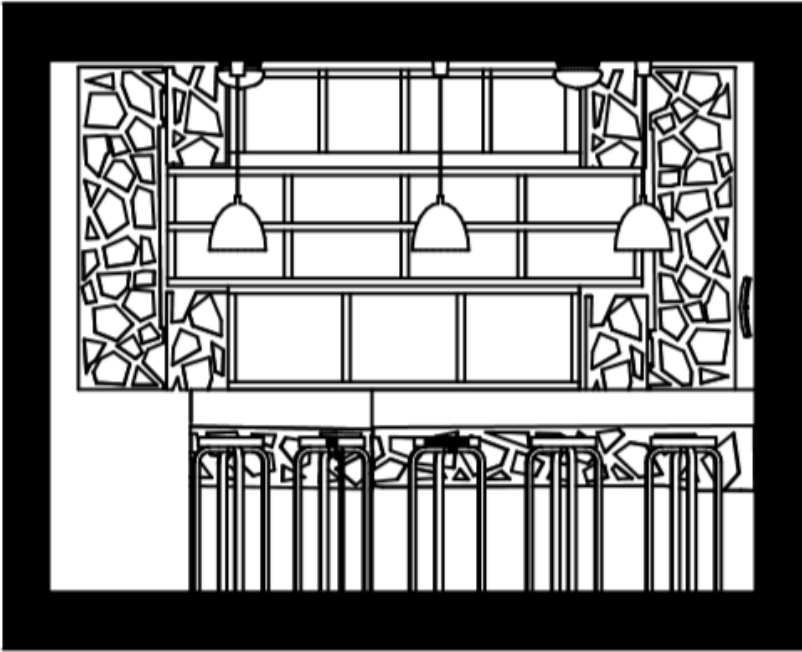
Section of Exhibition space, Counter area (Source: Author's construct, 2020)
